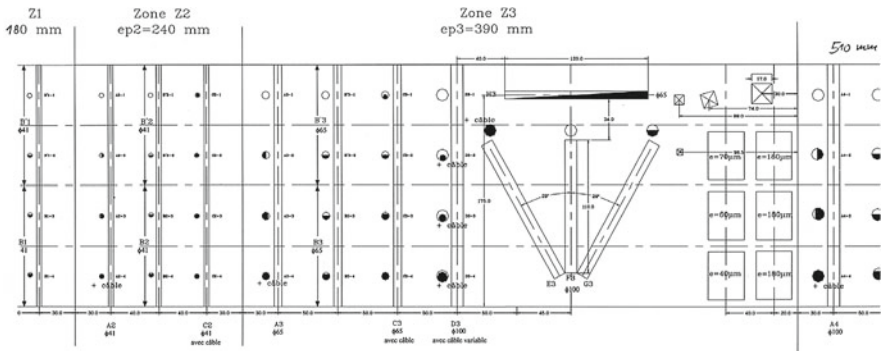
Concrete specimen “Wall”, LCPC Lyon
